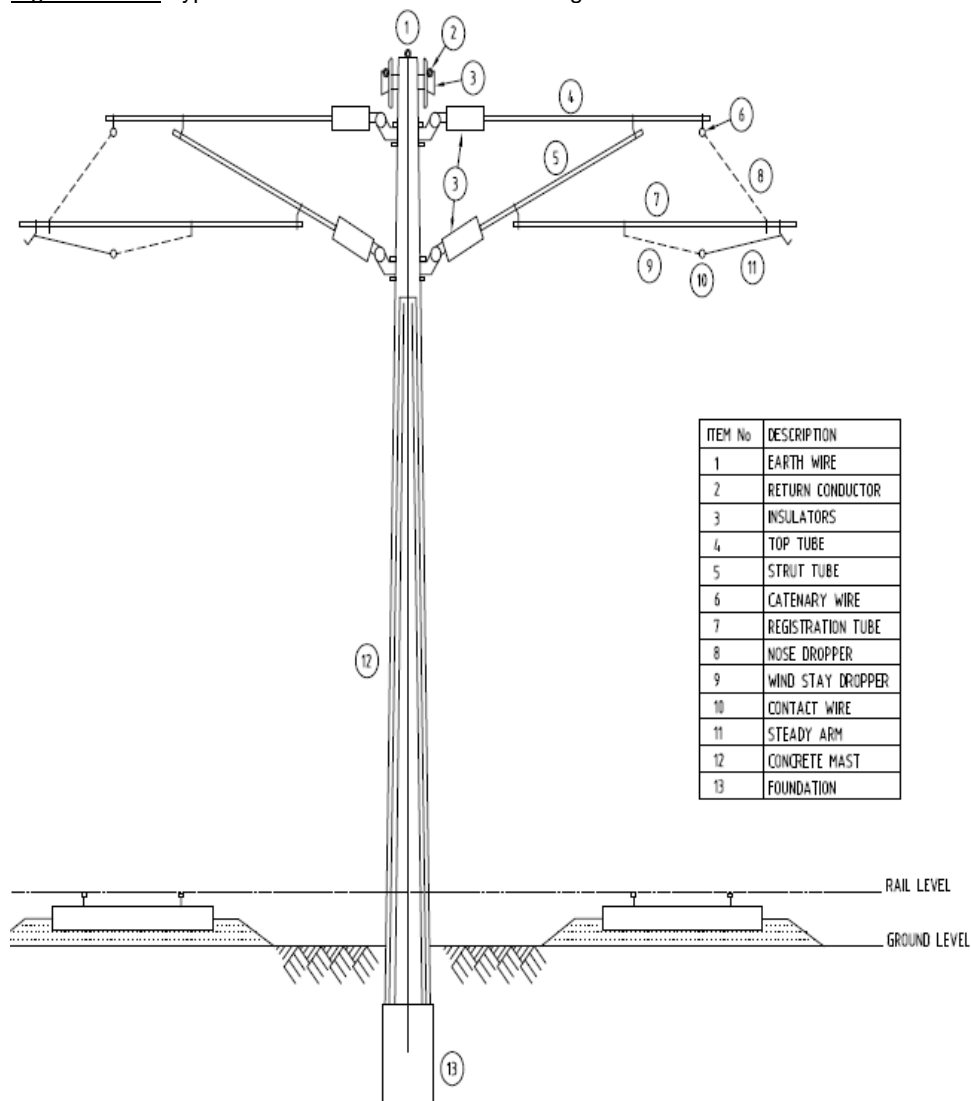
Typical Back to Back Cantilever Arrangement in PTA Electrified Area.
